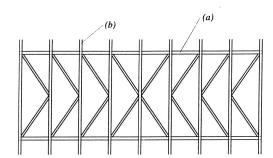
K-truss. (a) Braced beam, (b) purlin.
